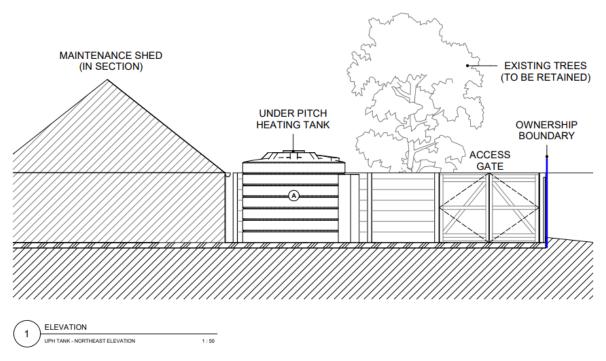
North-east elevation showing fuel tank and surrounding development, as existing
